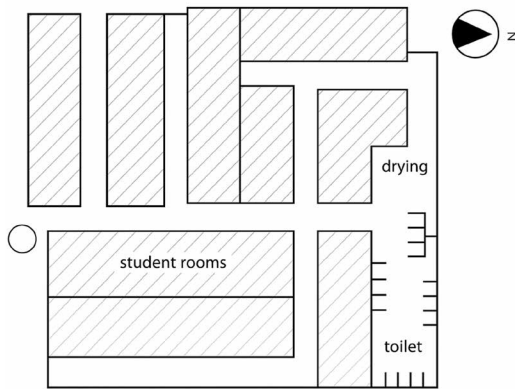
Layout of Casablanca Hostel: A Reconstructed Plan.
